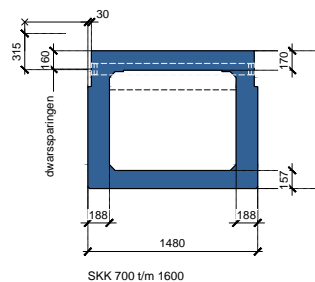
Cross-sectional dimensions for prefabricated box girders with $h = 1200$ mm in NSC [Spanbeton, 2017]
